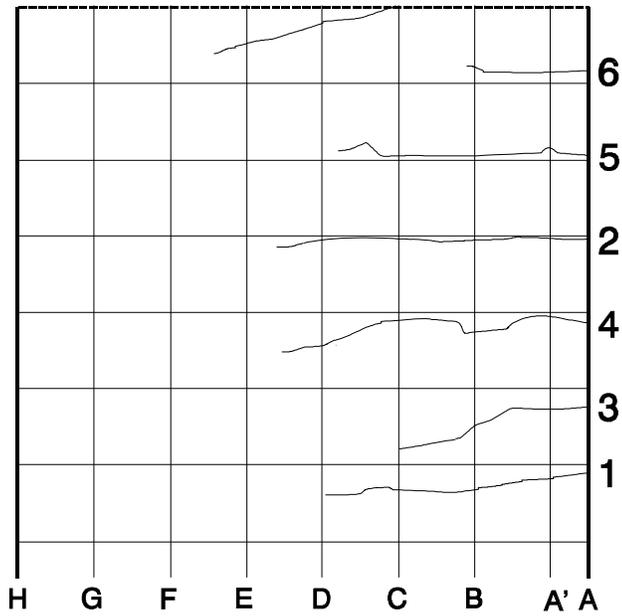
POJ-PU-54-TH cracking pattern on south face of pier at service load
